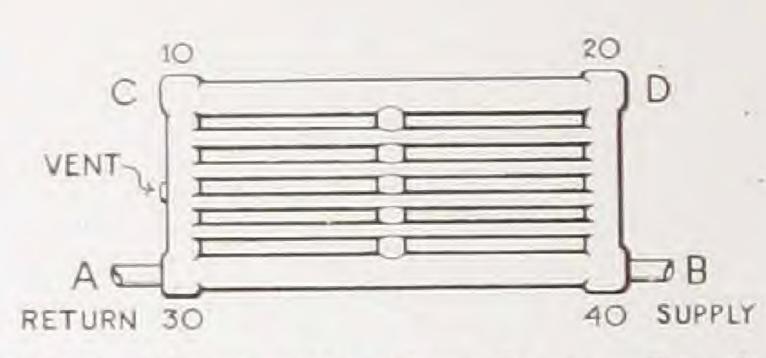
One and Two-Pipe Steam - Regular Horizontal Assembly
